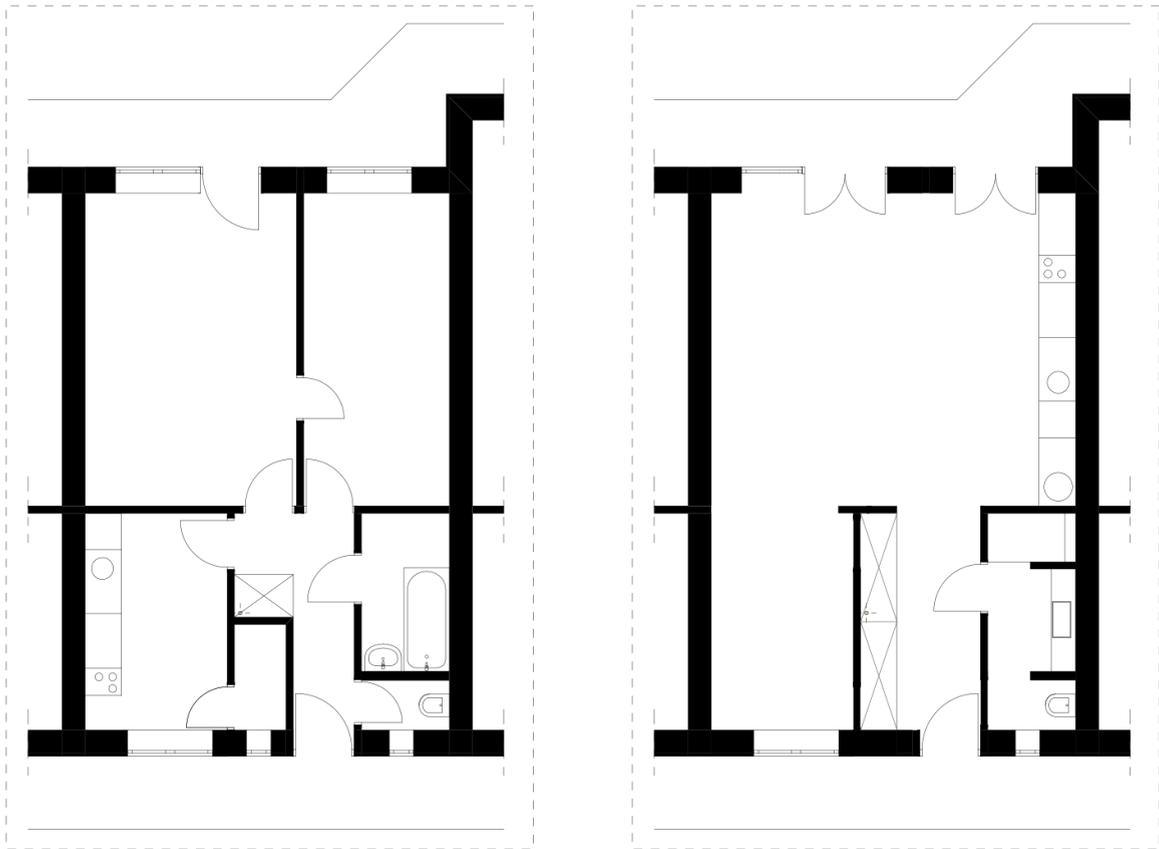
(a) original floor plan; (b) floor plan after renovation
